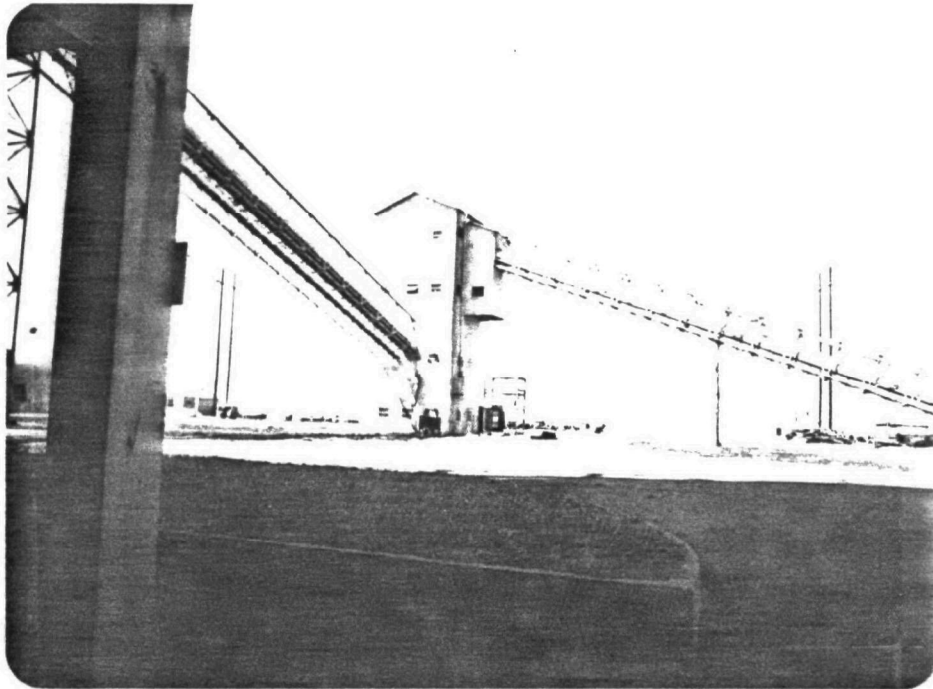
View from ground level facing southwest showing the coal conveyors and the transport house.
